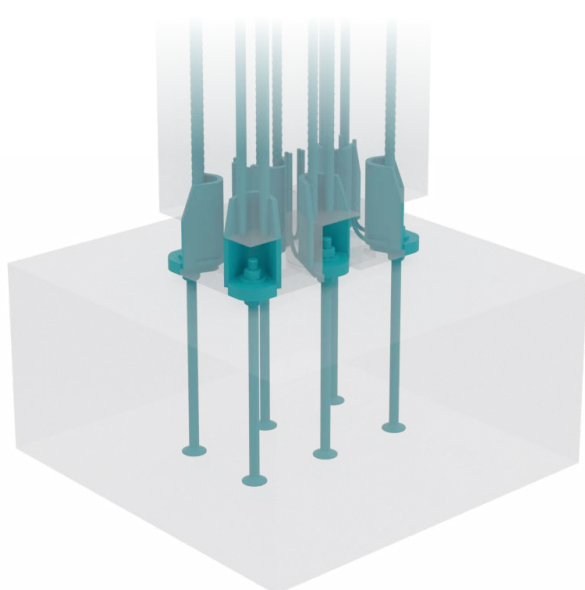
HULCO® Anchor Bolts in a concrete column to footing connection.
